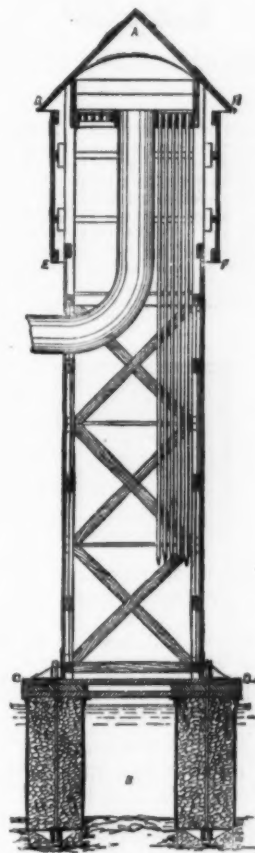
SECTIONAL ELEVATION THROUGH A B ON PLANS.
